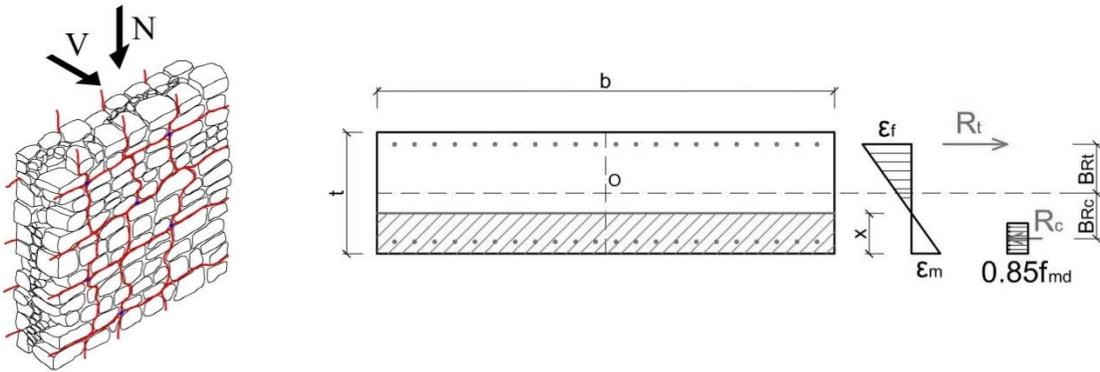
Stress – strain distribution into reinforced section (under compression and bending): out-of-plane behavior.
